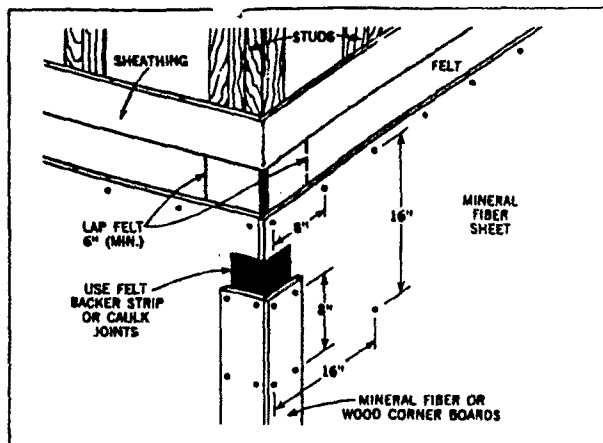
EXTERIOR CORNER BOARDS - Either caulk at sheet joints or use a felt backer strip over sheet joints behind corner boards.
